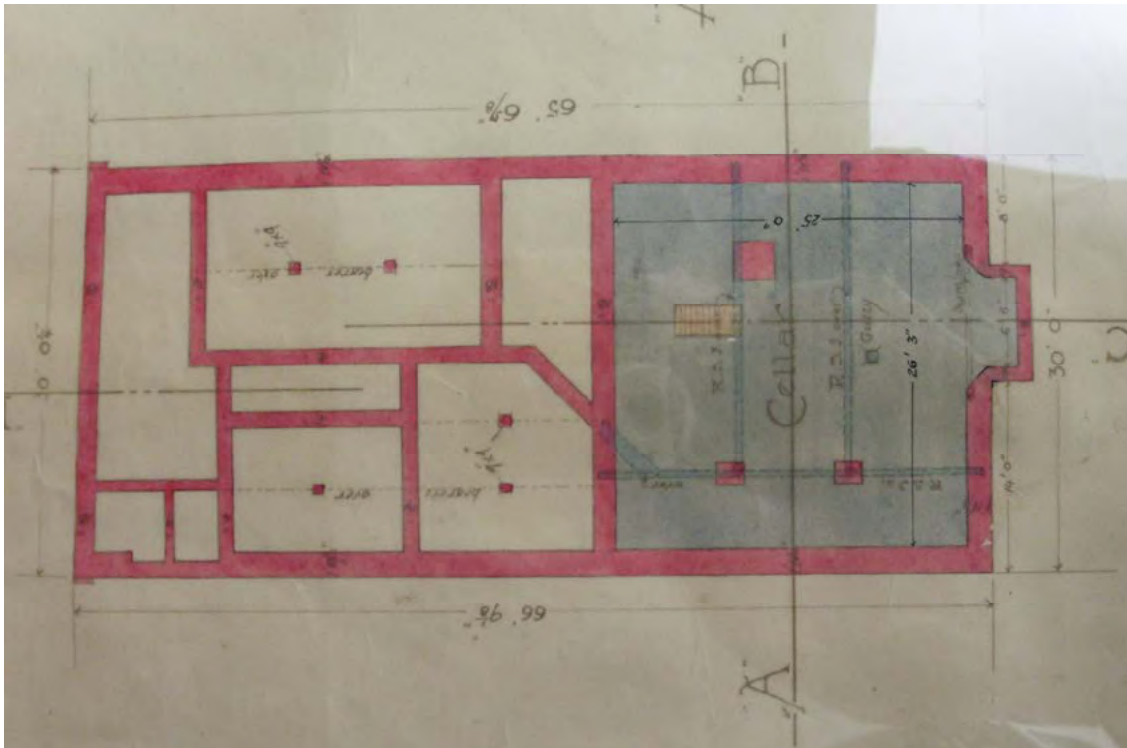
Cellar and subfloor plan- the entire basement was lost as part of the 1980s excavation.
